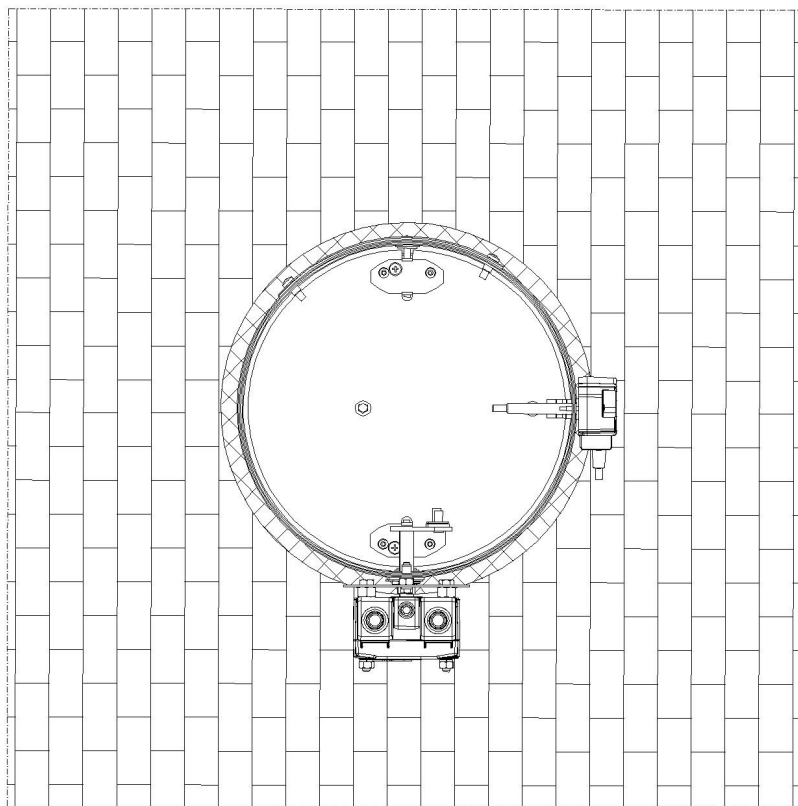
Installation of KTM-O fire dampers in rigid wall with vertical rotation axis of baffle
